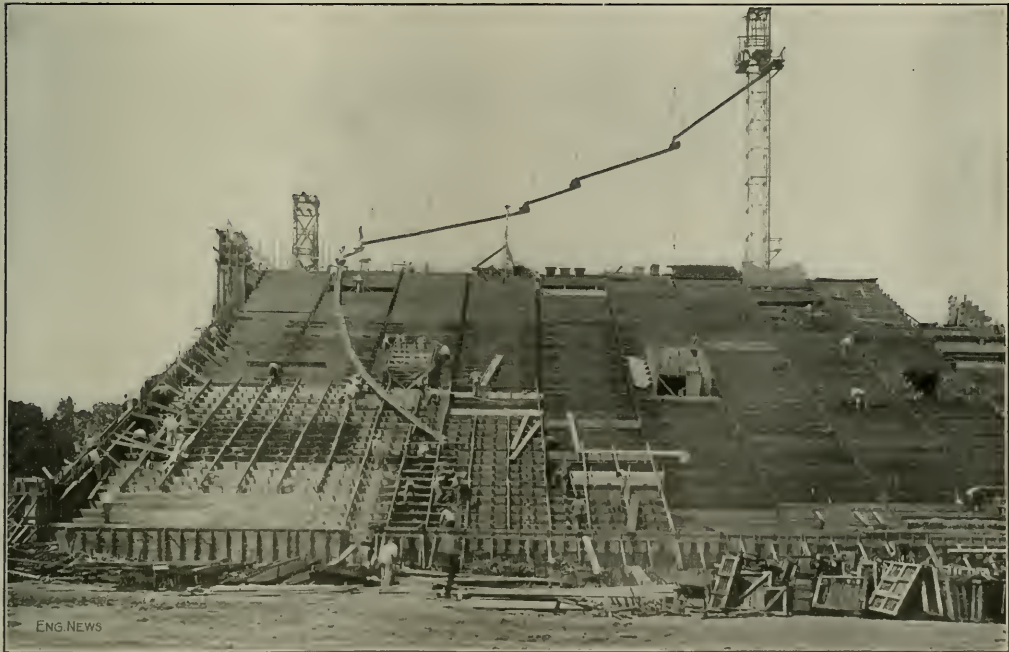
LONG CHUTTING OF CONCRETE FOR LOWER SECTION OF DECK, PRINCETON STADIUM
